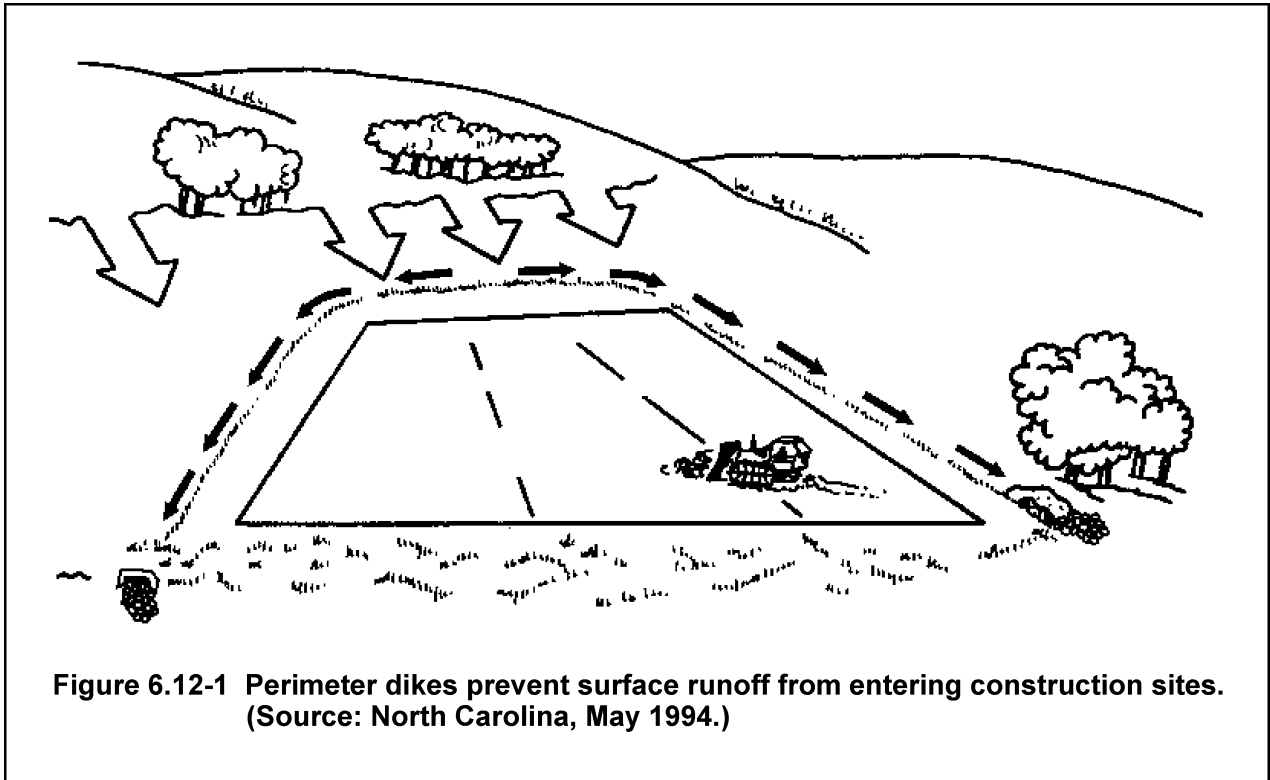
Perimeter dikes prevent surface runoff from entering construction sites. (Source: North Carolina, May 1994.)
